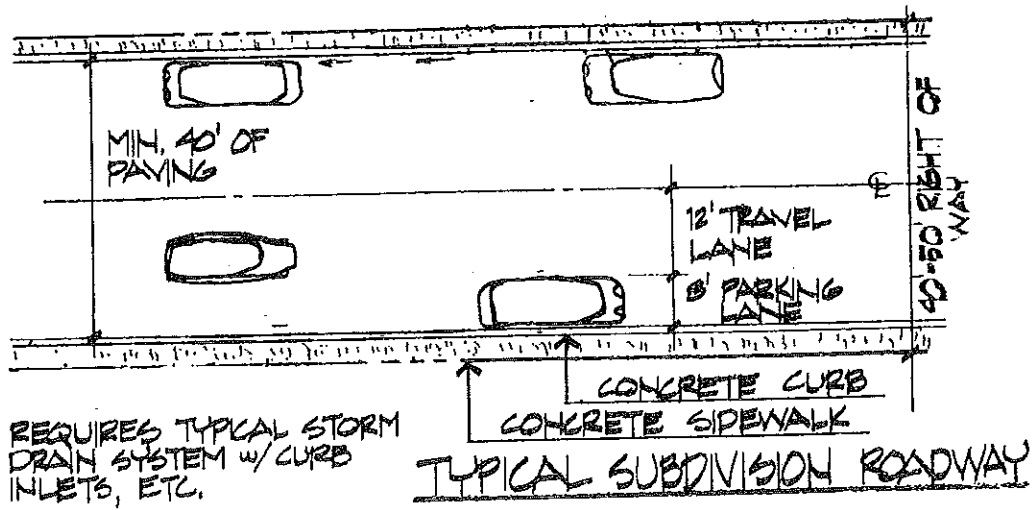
PLAN FOR TYPICAL ROADWAY DEVELOPMENT
